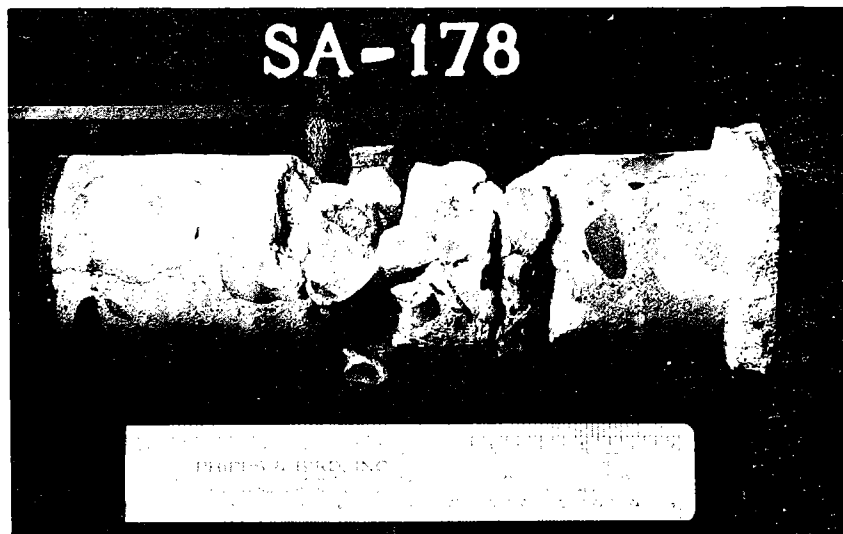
Vertical crack below epoxy surfacing and broken condition at steel. Plate 4 shows the hole from which this core was removed displaying horizontal fractures in the wall.
